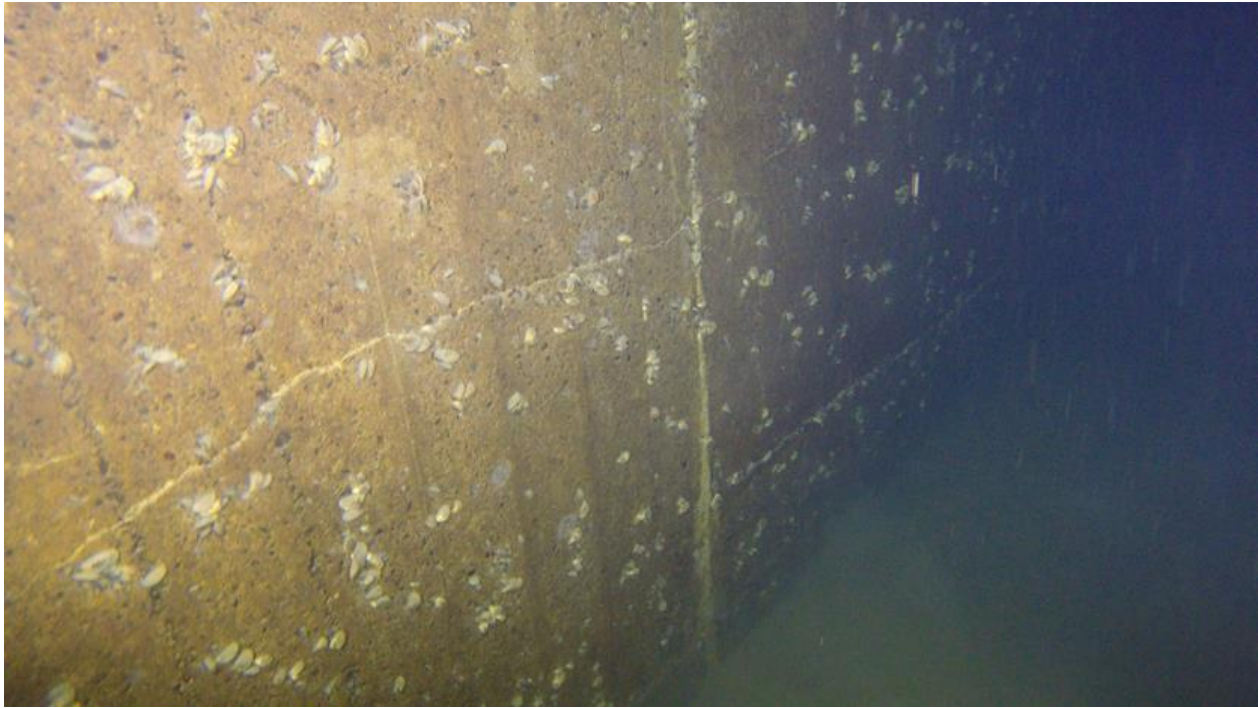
ROV view of interior concrete wall in discharge tunnel
